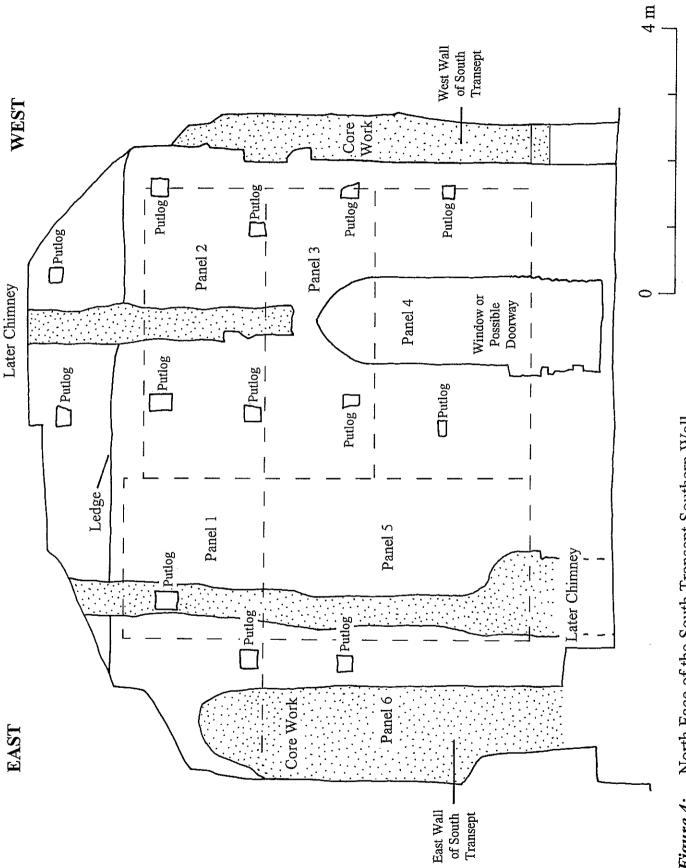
North Face of the South Transept Southern Wall (showing location of photogrametric grid).
